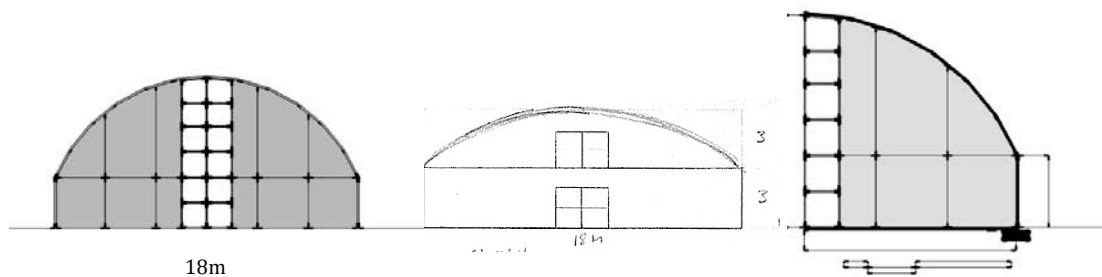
(Left to Right), Elevation of revised 18m building compared to original sketch & section drawing for 18m building. New drawings recreated by author from Judd drawings.
